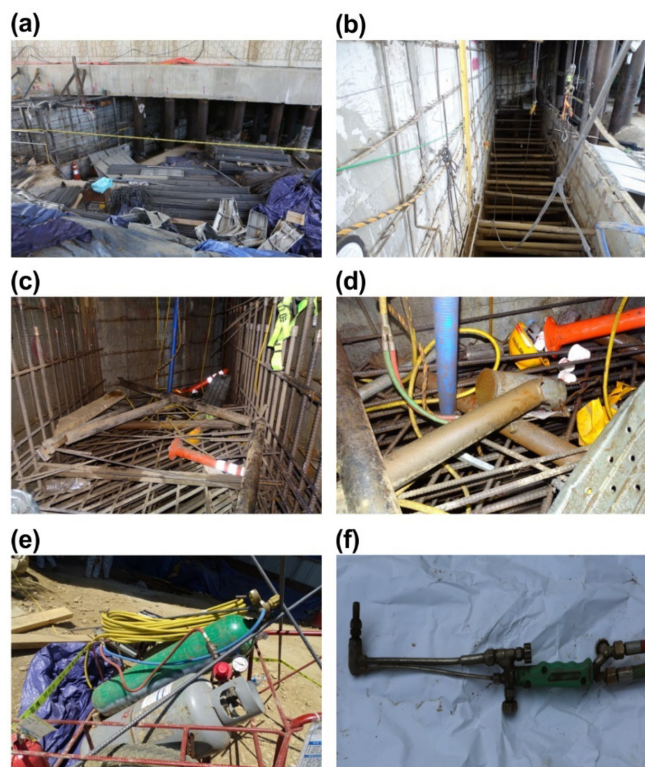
(a) Complete view of the accident site; (b) Outside the trench; (c) Inside the trench where the ignition occurred; (d) Place where the torch was found inside the trench; (e) Welding and cutting rods, LPG, and oxygen tanks; (f) Welding and cutting torch.
